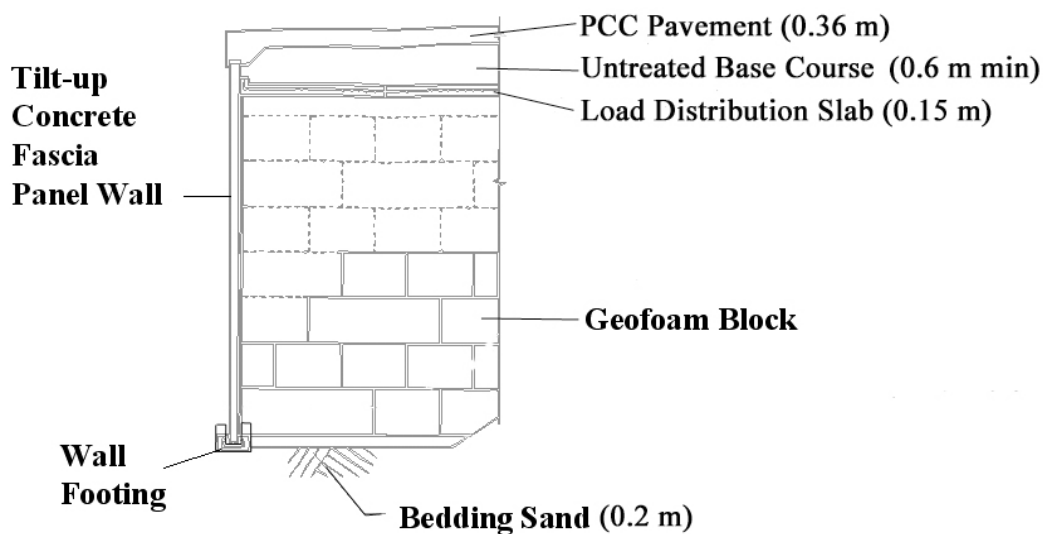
Typical geofabric cross-section used for the I-15 Reconstruction Project.
